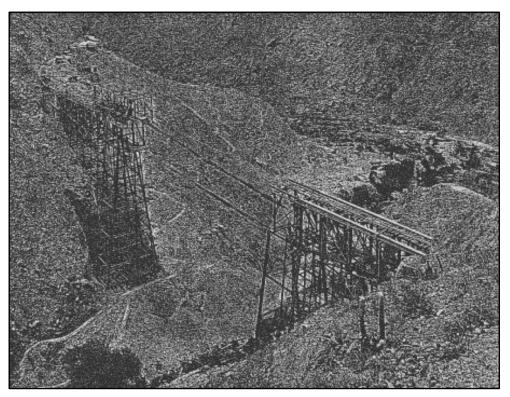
Aerial view of on-going new construction of cantilever span on Lima side (left).
